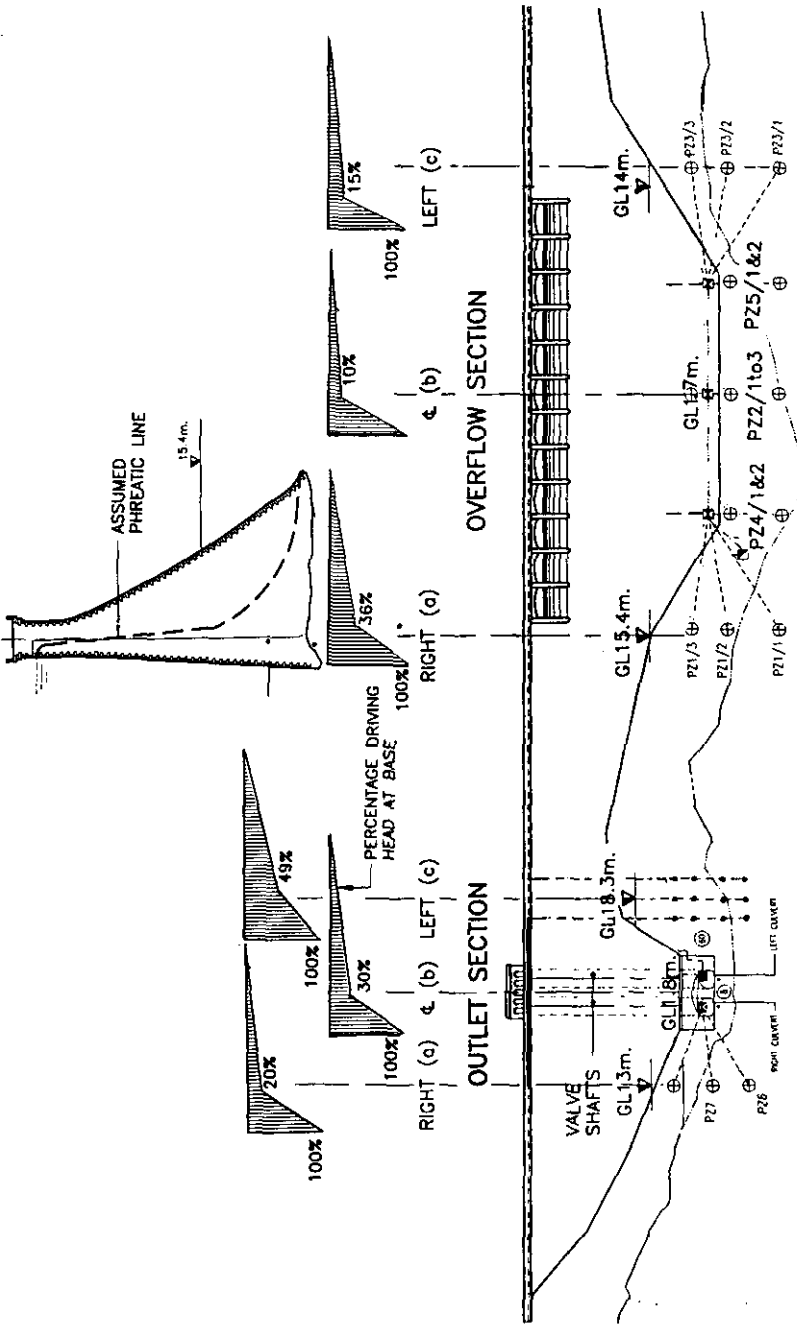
Elevation showing cross-sections of the dam analysed, and assumed pore pressures at base
